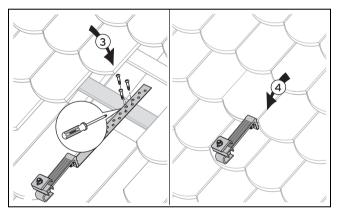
Screw on the type S flat roof bracket and lay the slates again (shown here: on the roof batten)
